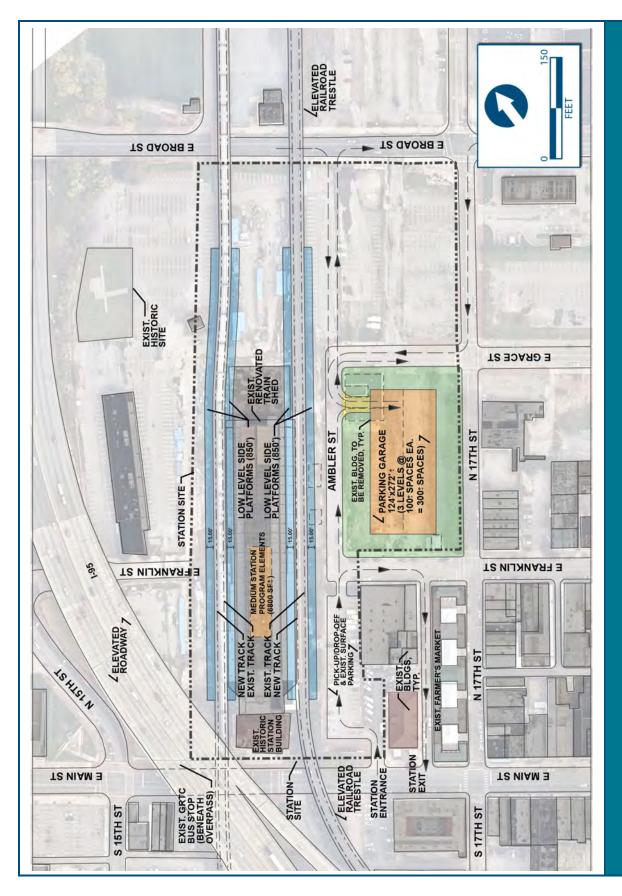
Main Street Station Improvements for Build Alternative 6F
